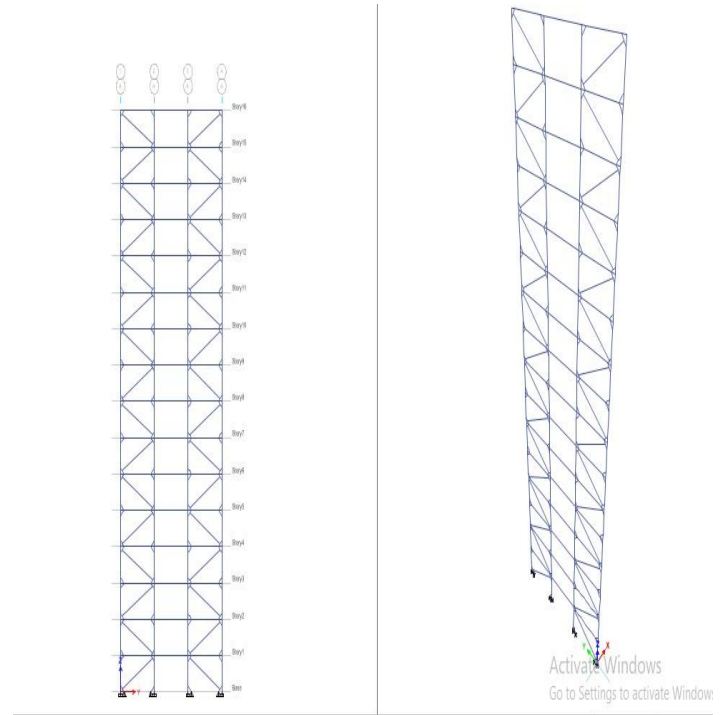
Building with Diagonal -knee brace a)Elevation
